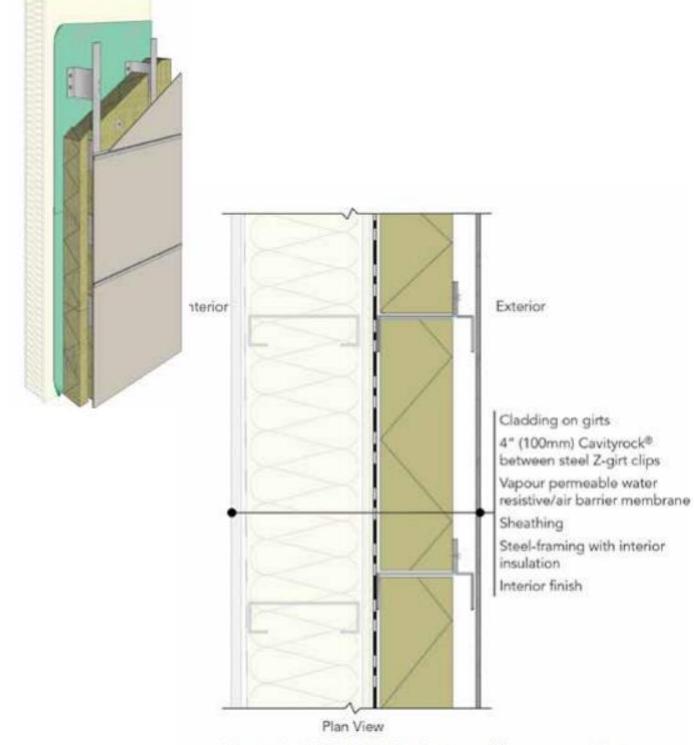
ROCKWOOL Cavityrock between a Z-girt clip system, installed over an existing steel stud wall
